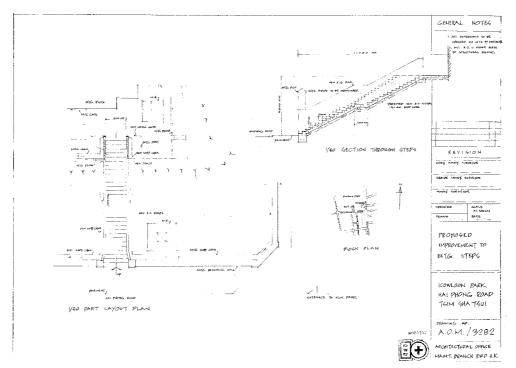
Proposed Improvement to Existing Steps, Kowloon Park Hai Phong Road Tsim Sha Tsui, Architectural Office, dated 20 May 1977. (Source: Architectural Services Department, Microfilm File No. M000457)
